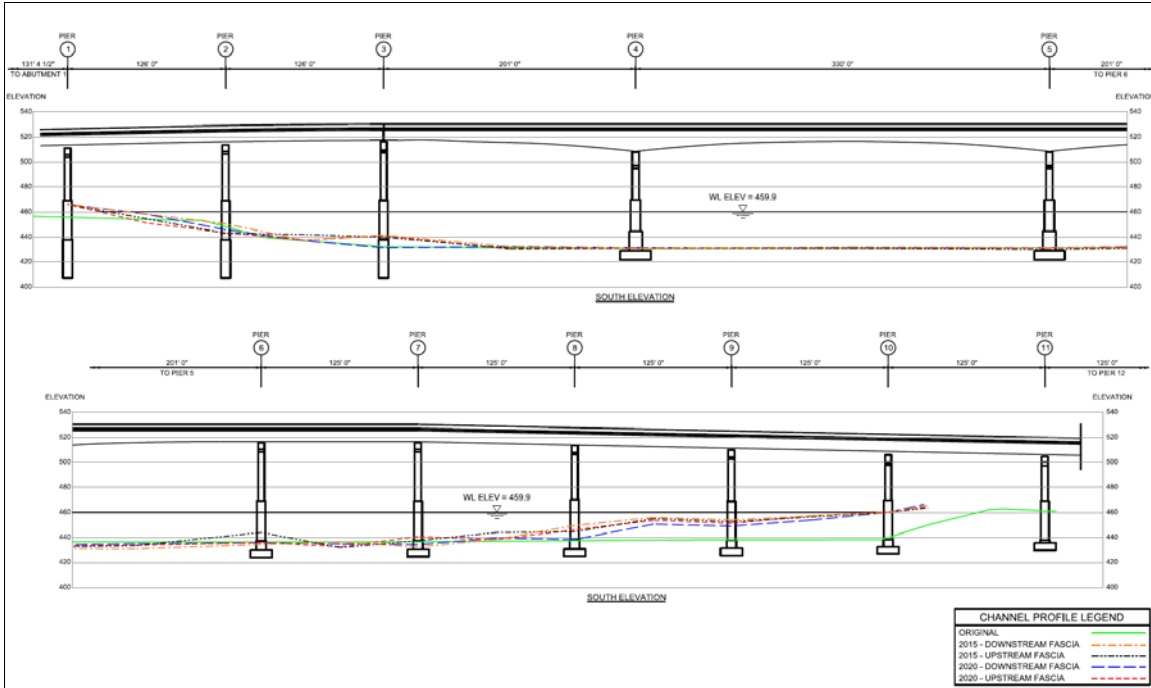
Bridge Elevation and Riverbed Data (CONSOR 2020)
